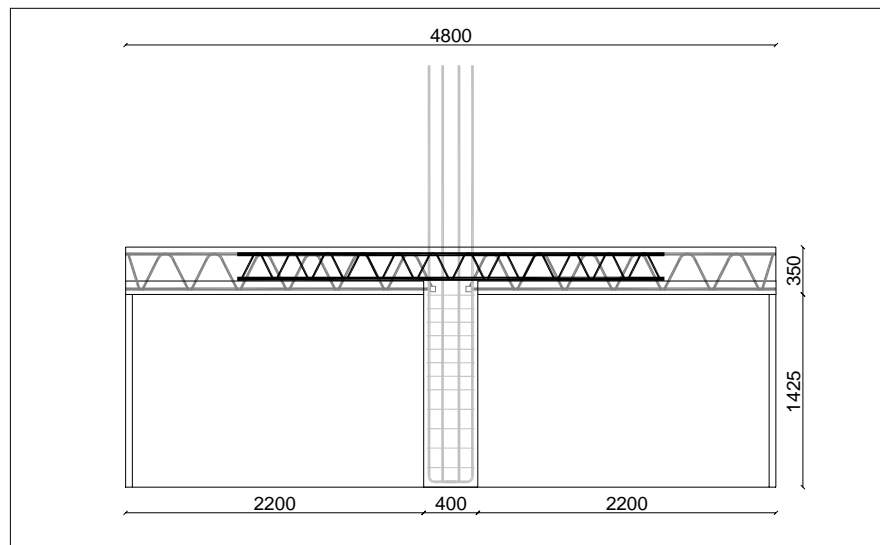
Floor concrete cast after the integrative truss positioning
